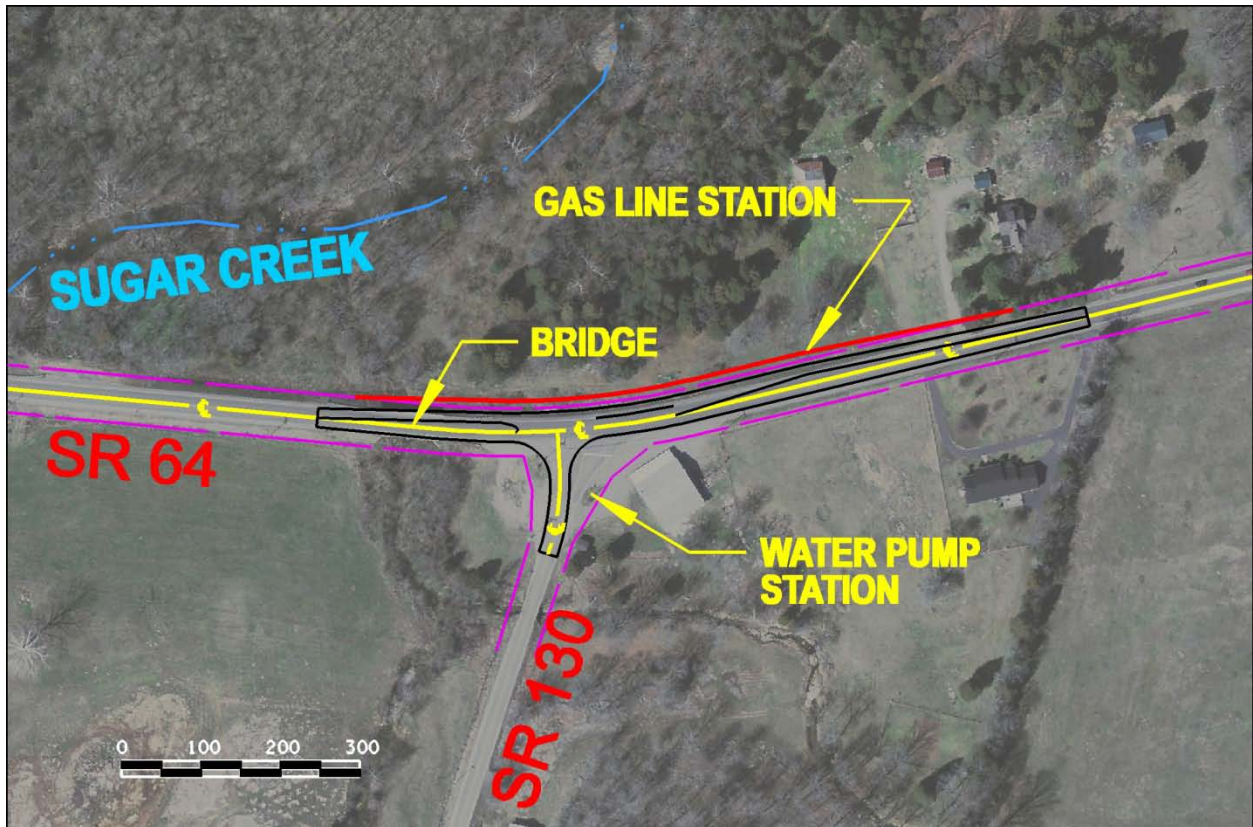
Plan view of Left Turn Lane at SR 130
